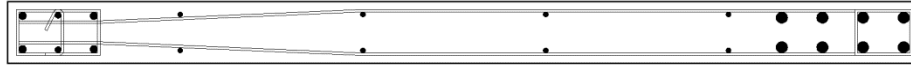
Schematic representation of wall cross section of specimens RWN, RWC and RWS.
